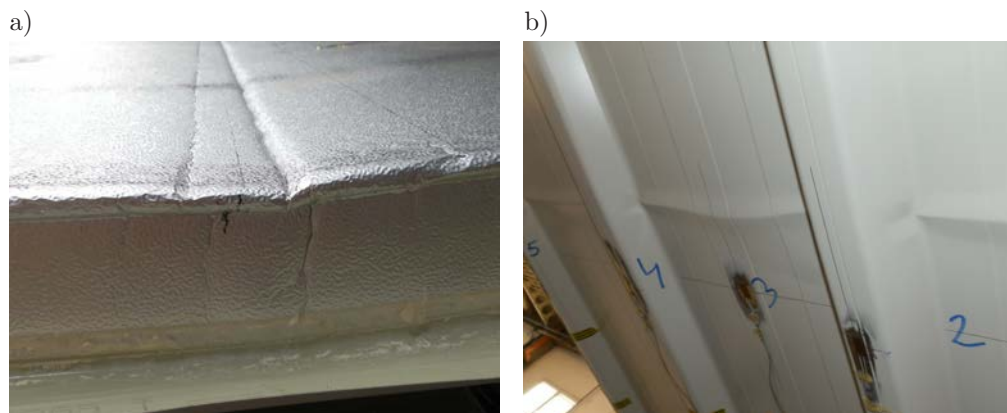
The damage mechanism in situation 2: a) local core crushing due to line loading, b) wrinkling of the steel face in the valleys.
